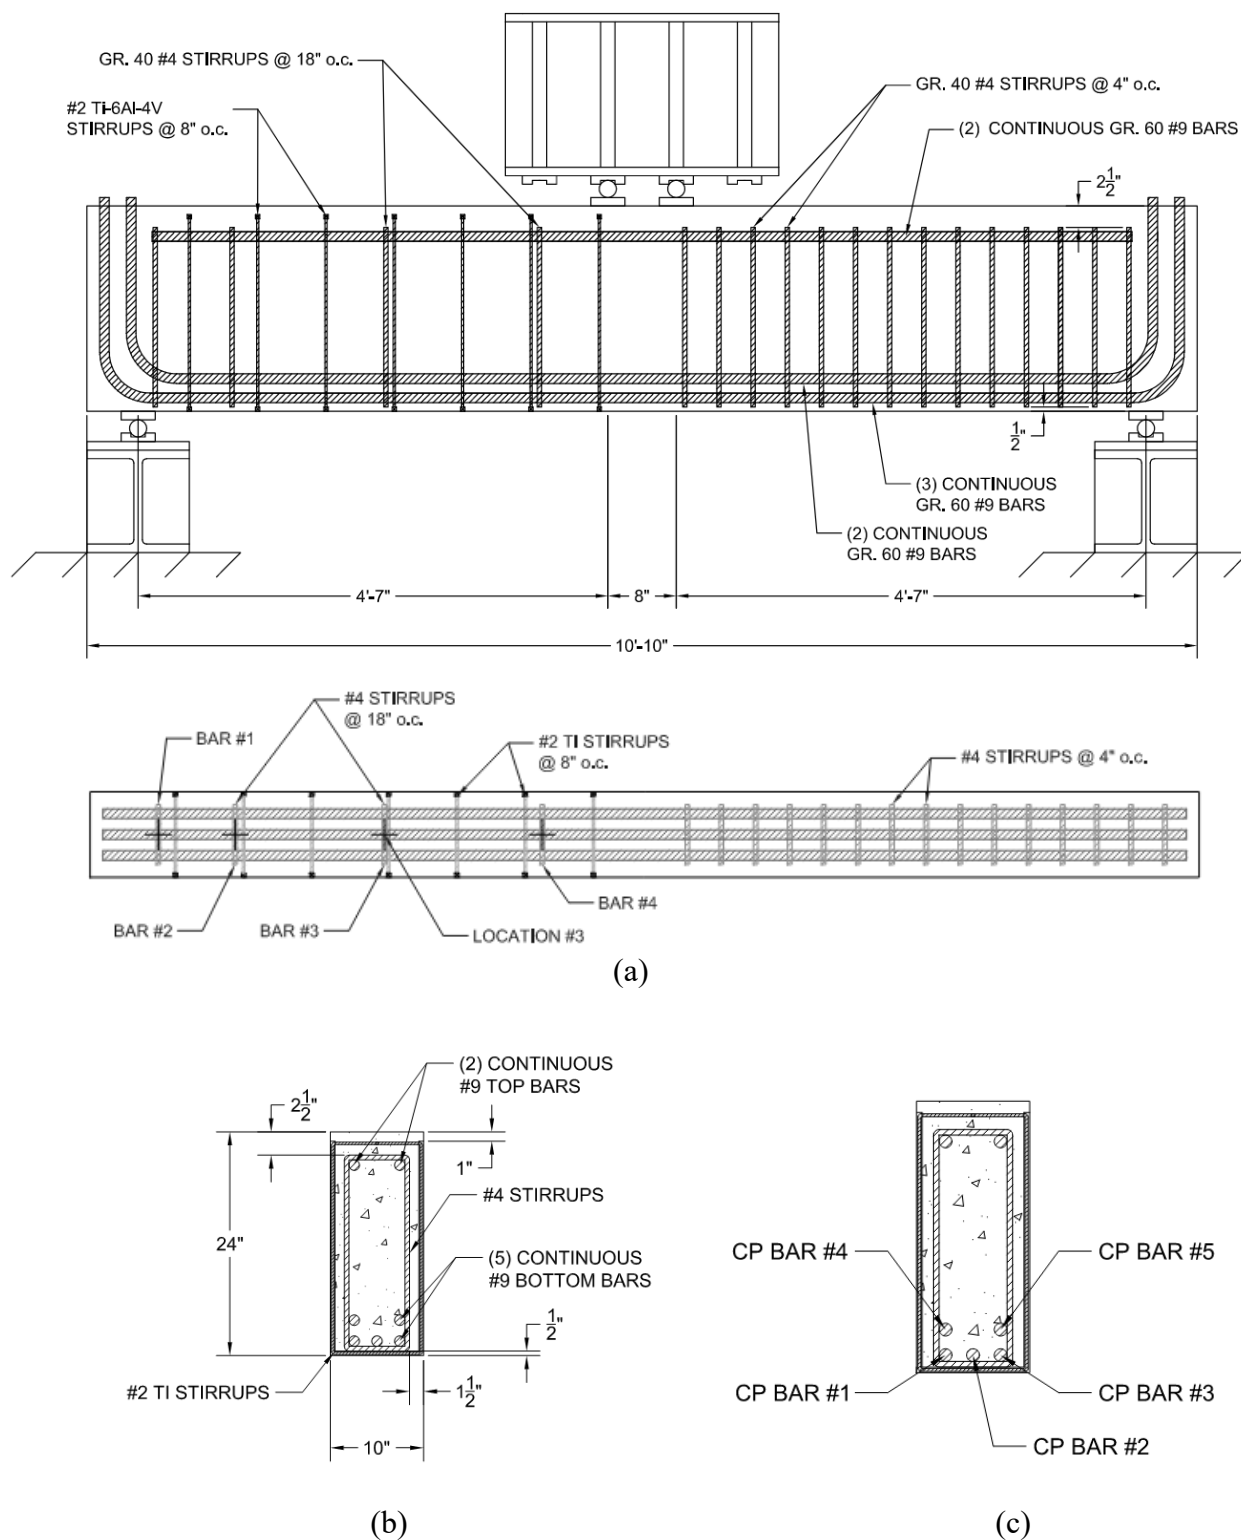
Shear beam (a) span, (b) cross section, and (c) ICCP bar numbers.
